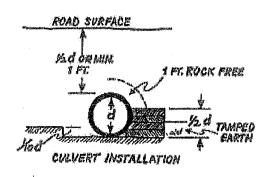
The elements of a properly installed ditch relief culvert. The culvert is angled at about 30 degrees to the road alignment to help capture flow and prevent culvert plugging or erosion of the inlet eres. It is set at the base of the fill (ideally) or with a grade slightly steeper than the grade of the contributing ditch (but never with a grade less than 2 percent) (USDA-SCS, 1923). At a minimum, the grade of the ditch relief culvert should be sufficient to prevent sediment accumulation at the inlet or deposition within the culvert itself (it should be self-cleaning) (USDA-SCS, 1993).
